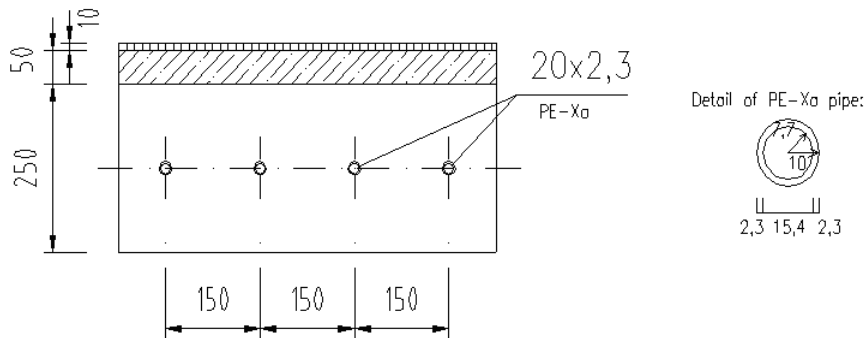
A representative part of the ceiling slab, the structure model and the dimension of pipes
